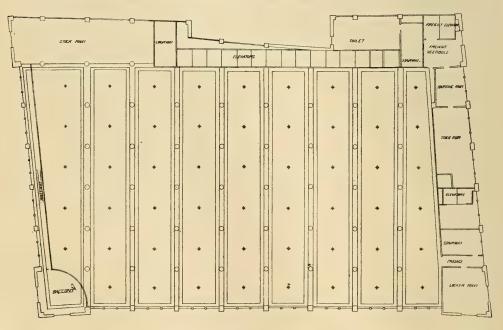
TYPICAL CEILING PLAN TO SIXTH FLOORS, INCLUSIVE, SHOWING LOCATION OF OUTLETS FOR LIGHTING FIXTURES.
